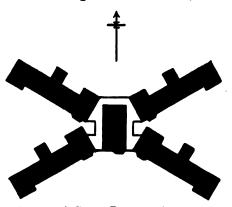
A BLOCK PLAN FOR SANATORIUM.
